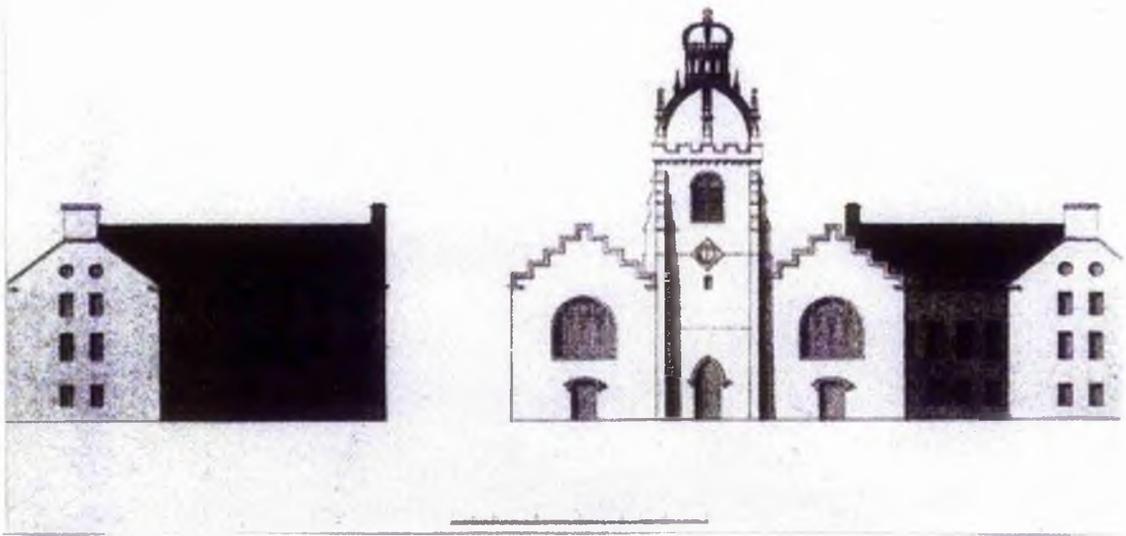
King's College. Proposed west elevation. J. Adam, 1773.
